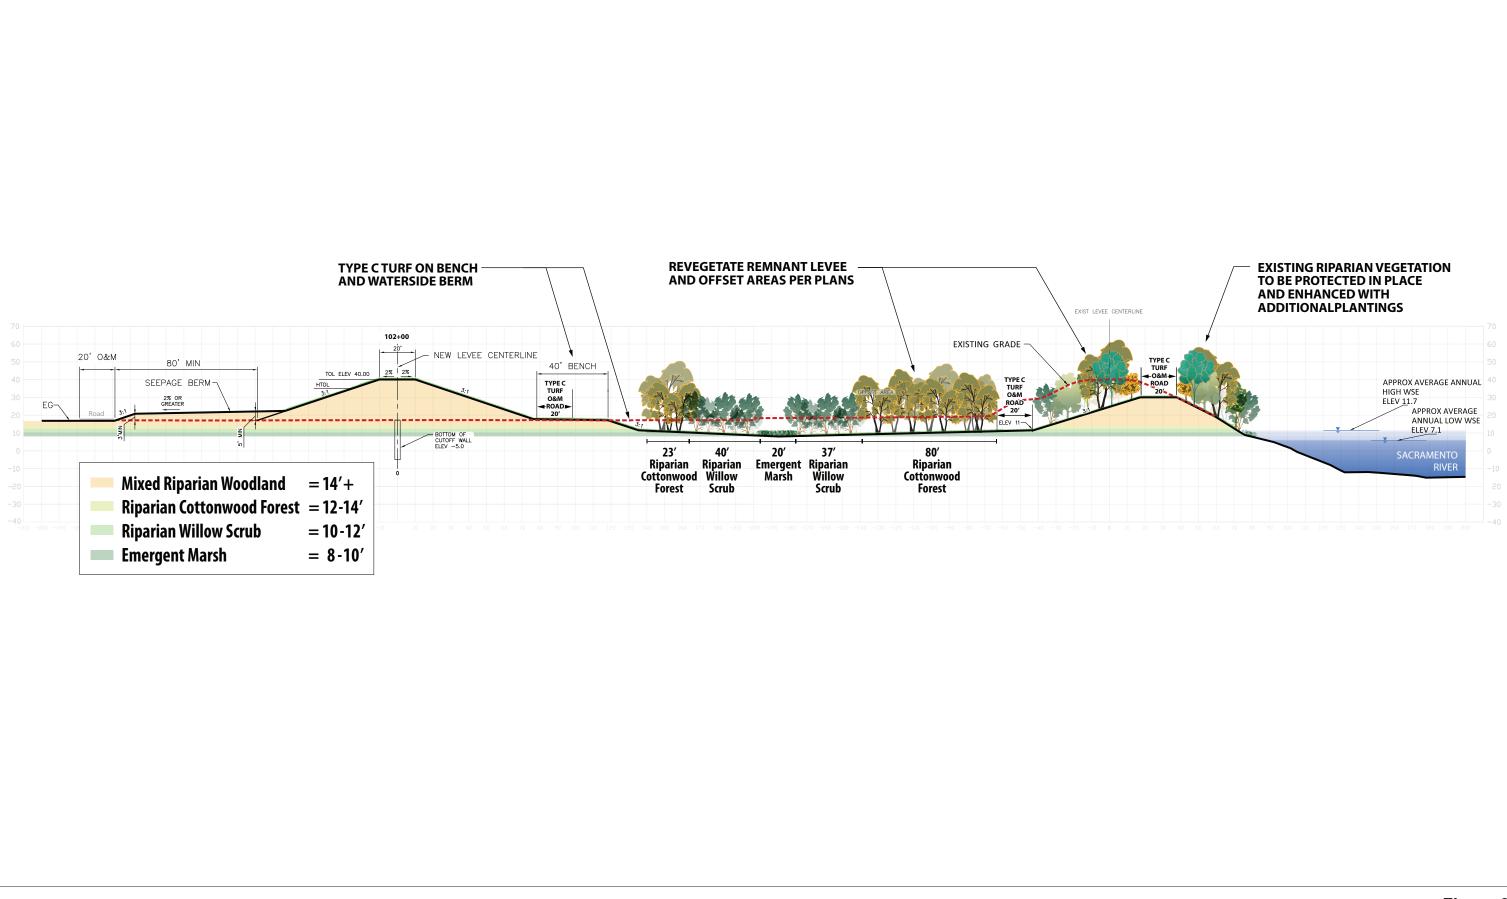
Typical Section of Proposed Levee, Offset Area, and Remnant Levee Proposed Levee Station 102+00
